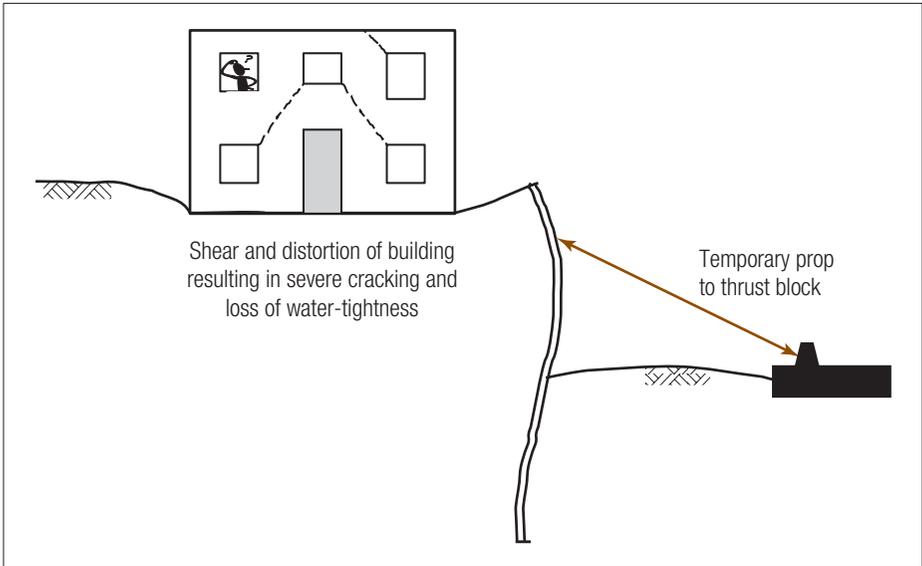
Loss of function of structure behind a retaining wall due to excess settlement (deformation controlled SLS)
